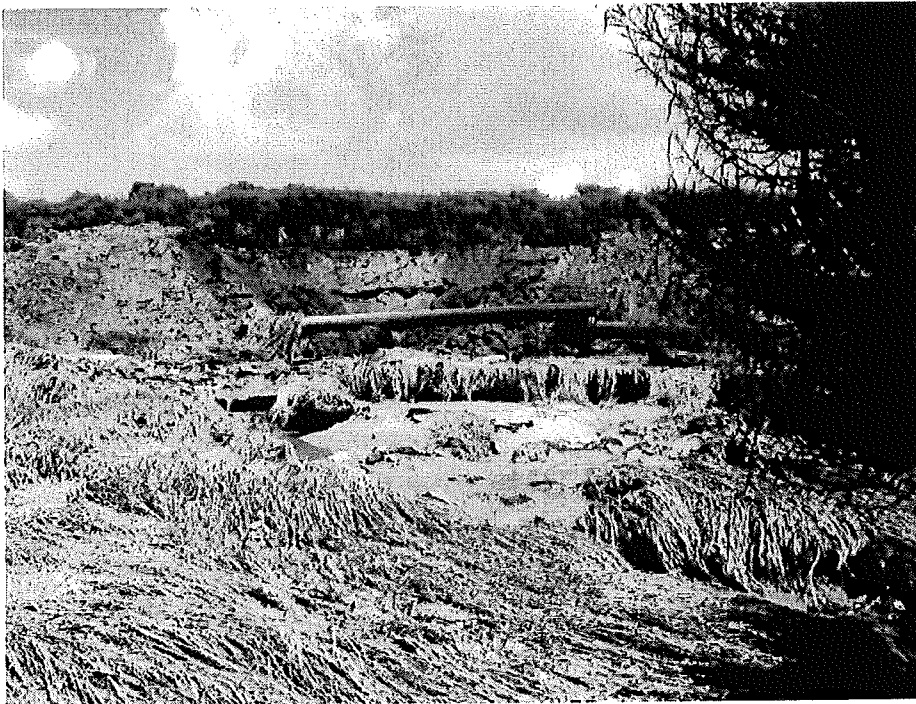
Liquid discharging into Bayou Casotte at site#2 Concrete Ditch/Break continued. 081913
